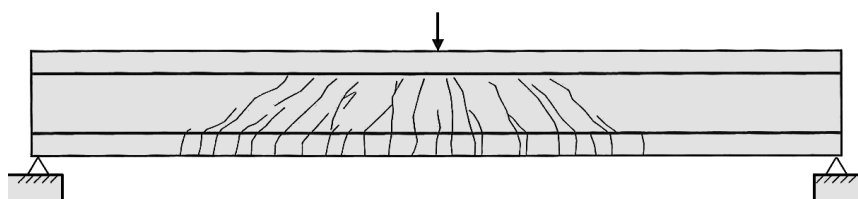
Wide cracks in a reinforced concrete beam under extreme loading
